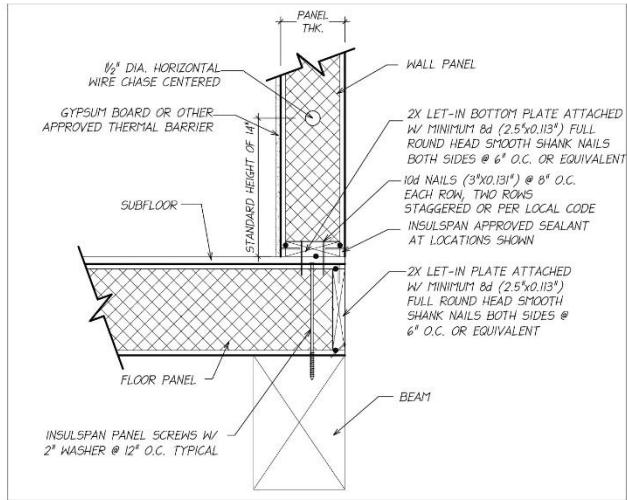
SIP Wall and SIP Floor Connection. Source: Insulspan
